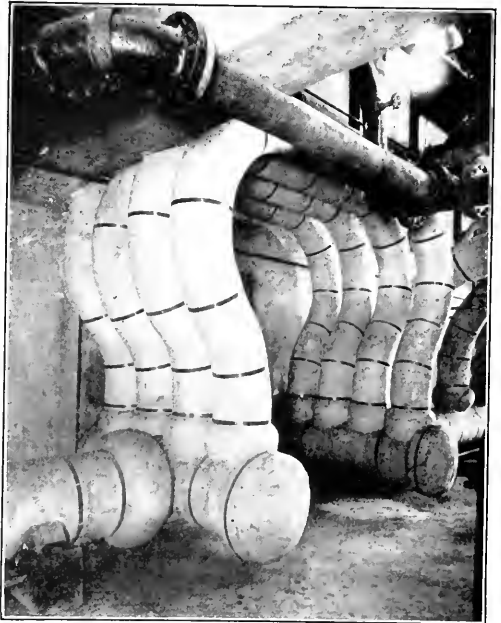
EXPANSION BEND IN MAIN STEAM HEADER
